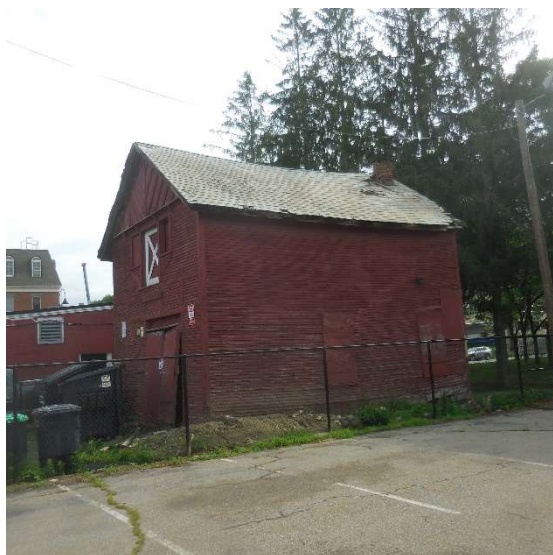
South-West Corner - Note ridge sag, swale in roof plane and hole in roof near chimney
